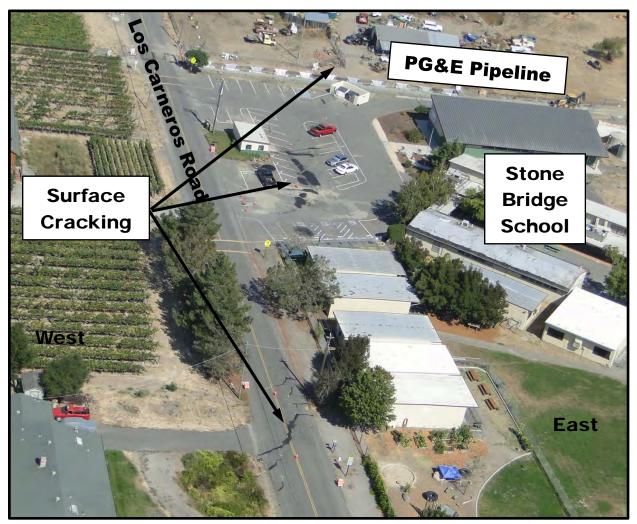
Aerial photograph of linear ground cracking across Los Carneros Road near Stone Bridge School (Point A12) – view looking towards the northeast [NSF-GEER; Napa, CA; N 38.243 W 122.321; Harder, L. F.; 09/01/14]
